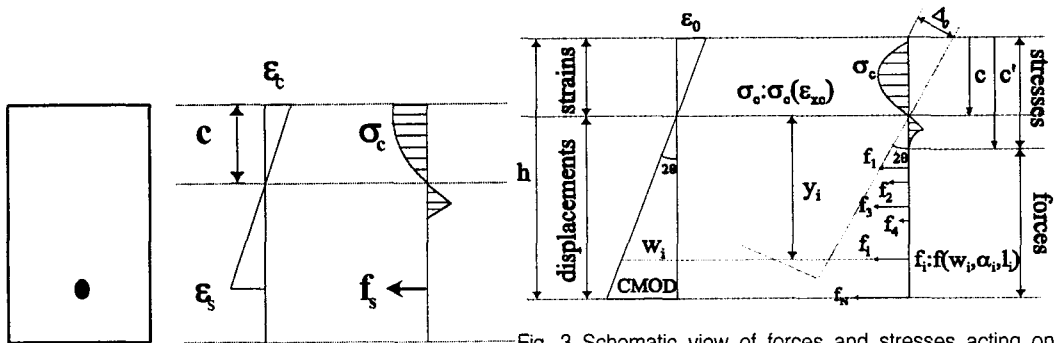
Schematic view of forces and stresses acting on cracked section of beam
